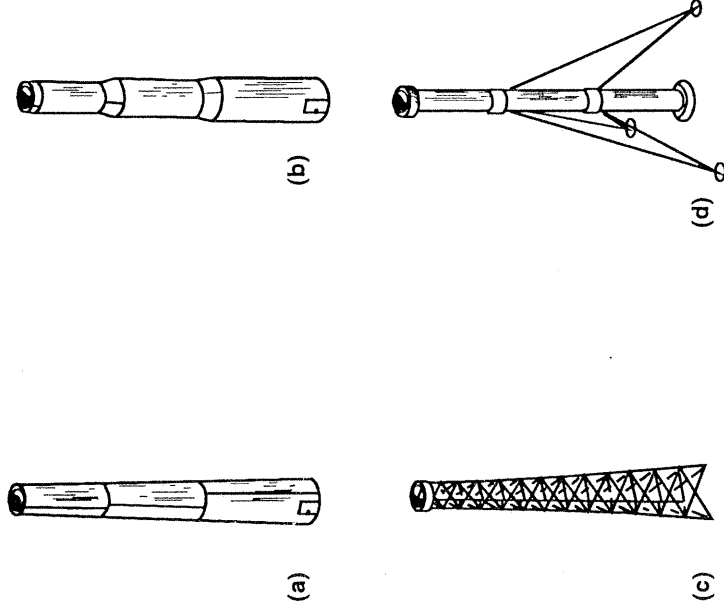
Typical HAWT tower configurations. (a) Shell (b) Stepped shell (c) Truss (or lattice) (d) Guyed shell (or, similarly, guyed truss)
